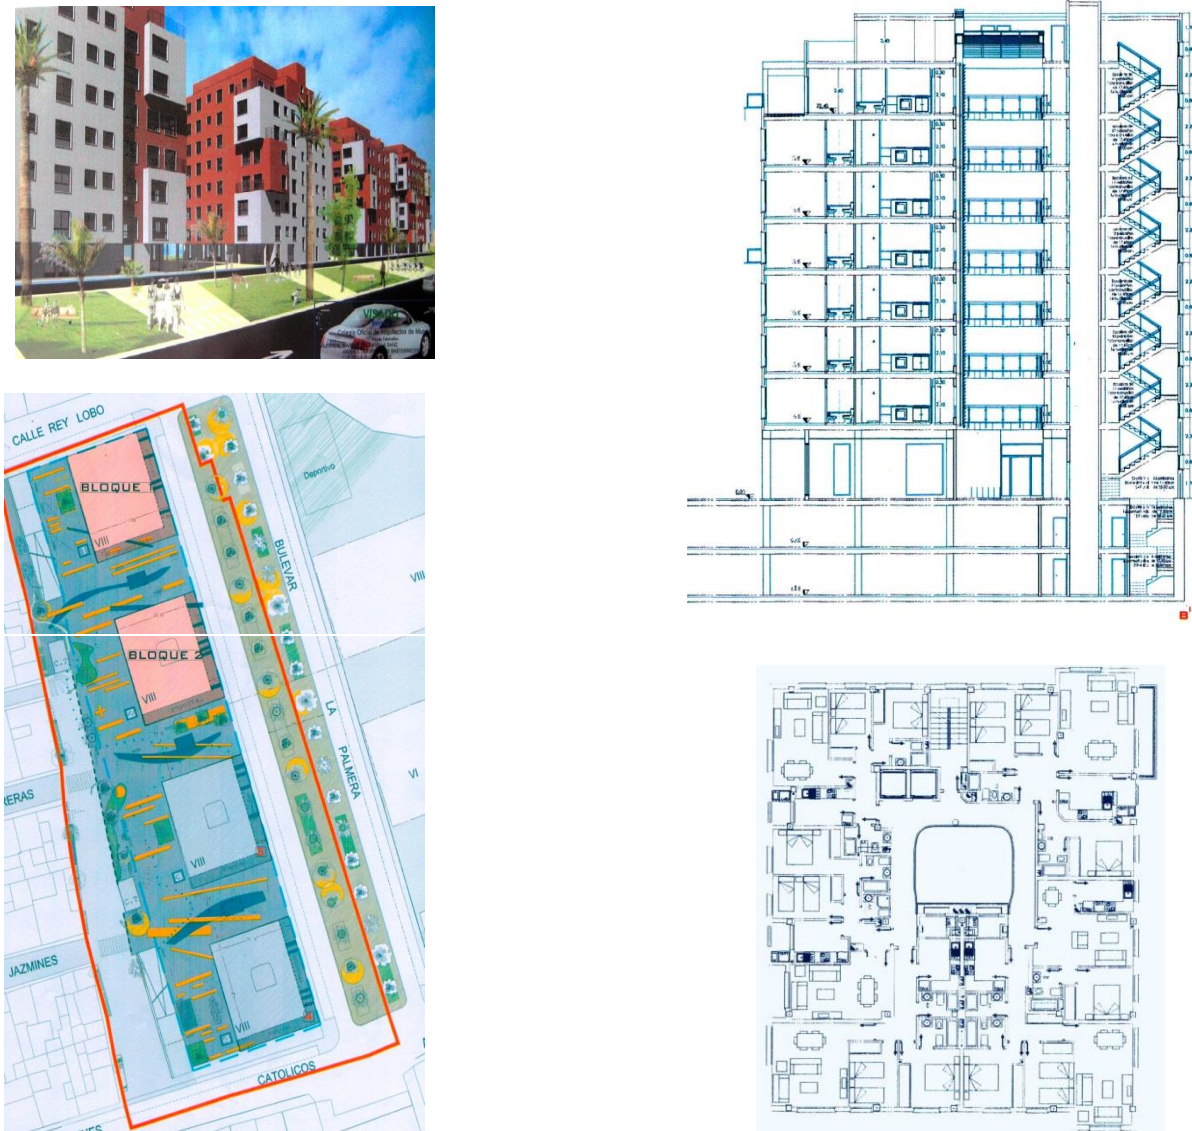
Figure 5: Perspective, floor plans and sections of 159 residences, retail spaces, parking garages and storage units
